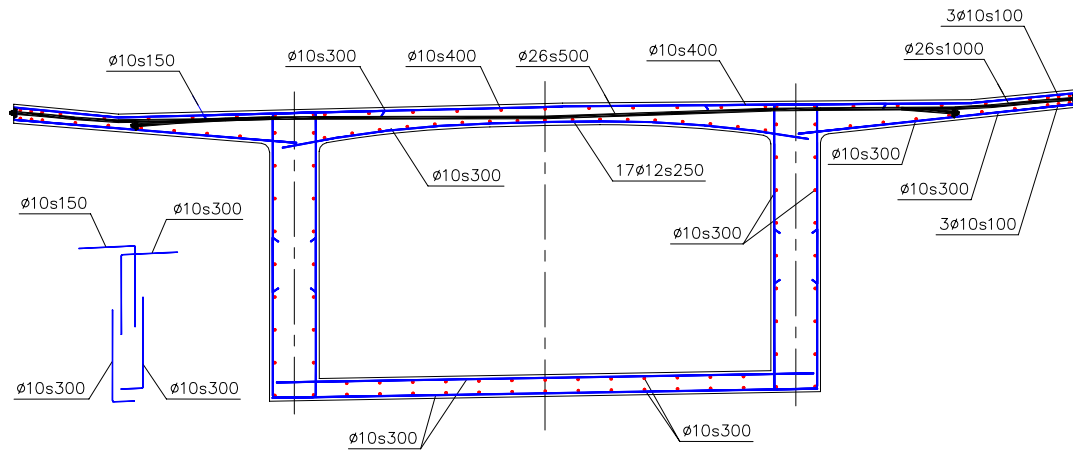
Cross-section and reinforcement layout in the critical section (29.5 m from the west pier, in the cantilever II). Longitudinal prestressing tendons not included. Modified from Plos³¹.
